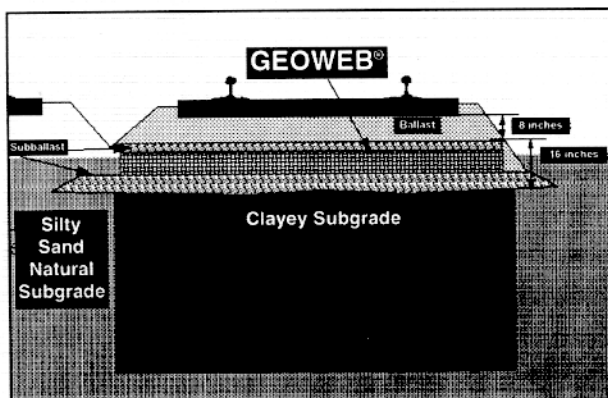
Track Construction with GEOWEB<sup>®</sup> in LTM Section of FAST
